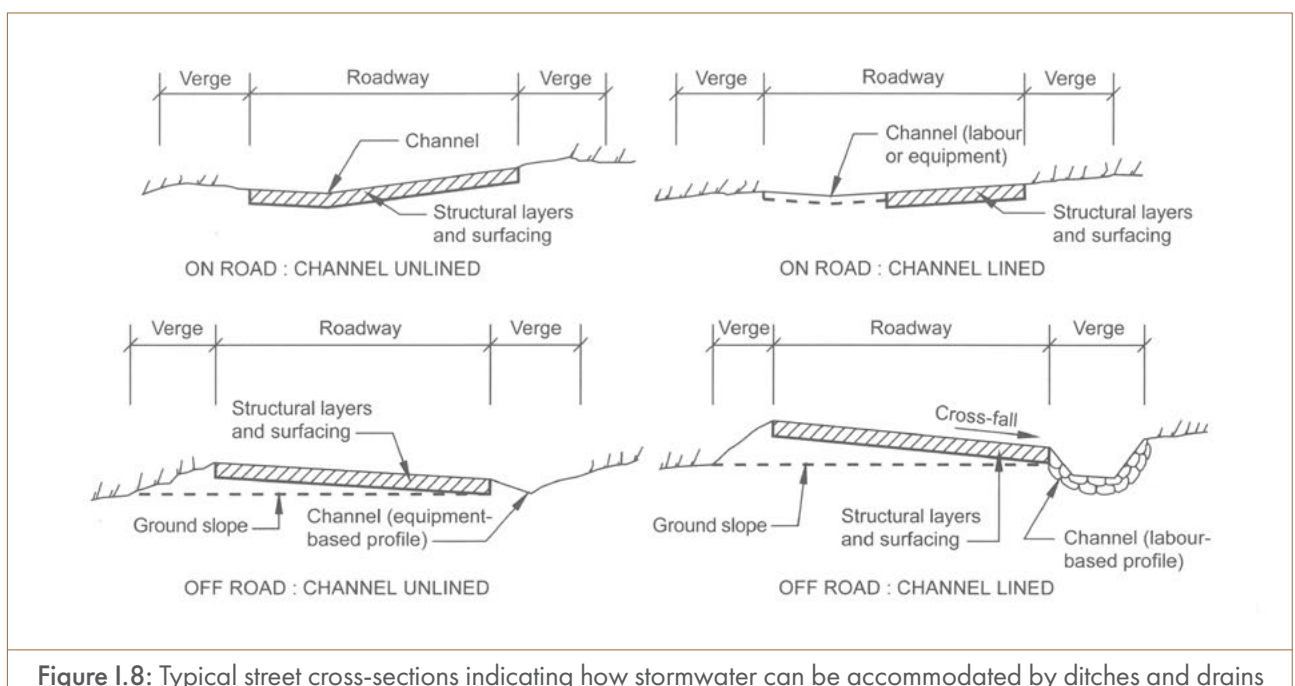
Typical street cross-sections indicating how stormwater can be accommodated by ditches and drains
